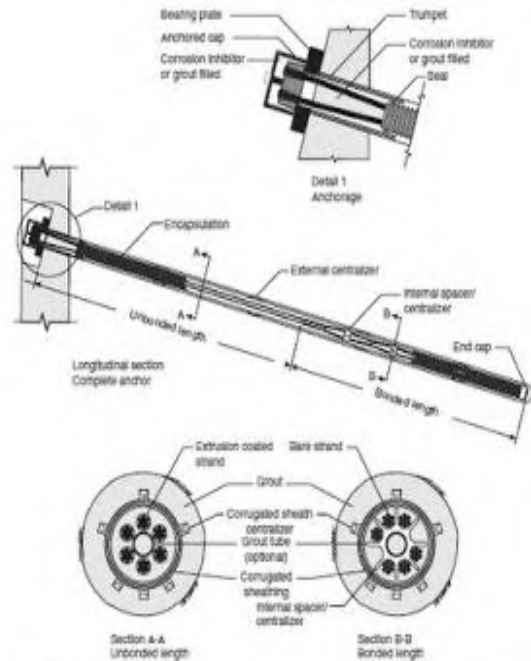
Typical multi-strand cable anchor with corrosion protection system comprising grouted corrugated plastic sleeve on bond length, and smooth grouted sheath on unbonded length (courtesy: Lang Tendon Inc.).
